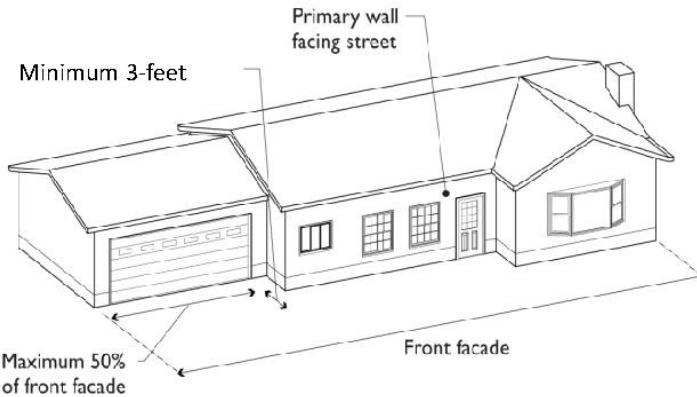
D(1): GARAGE FRONTAGE AND LOCATION
